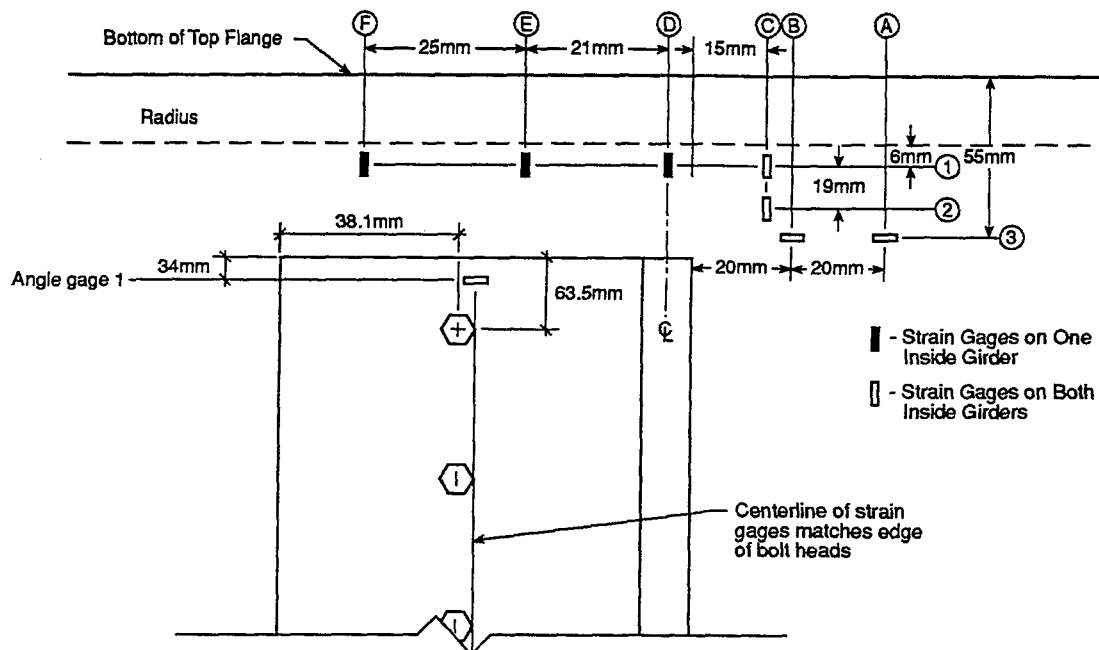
Gaging Pattern for Type EF Connections on Inside Girders
